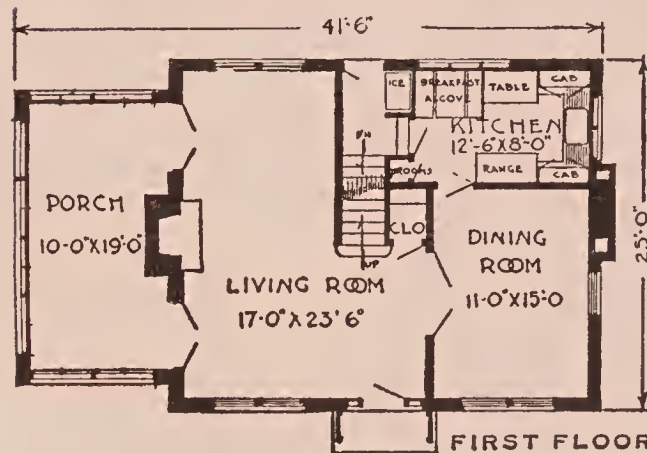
Draw the floor plan of your home. Use a scale of $3/8"=1'-0"$.
